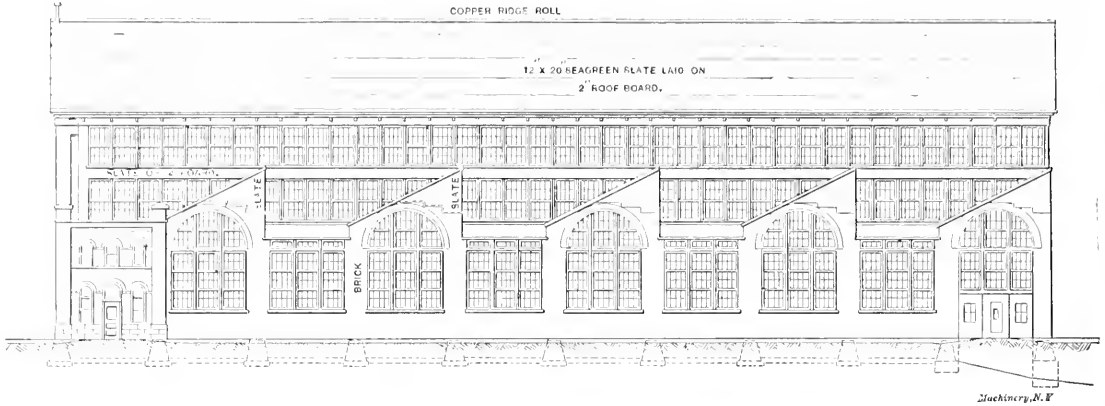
Side View showing Alternate Saw-tooth and Flat Sections of Roof.
